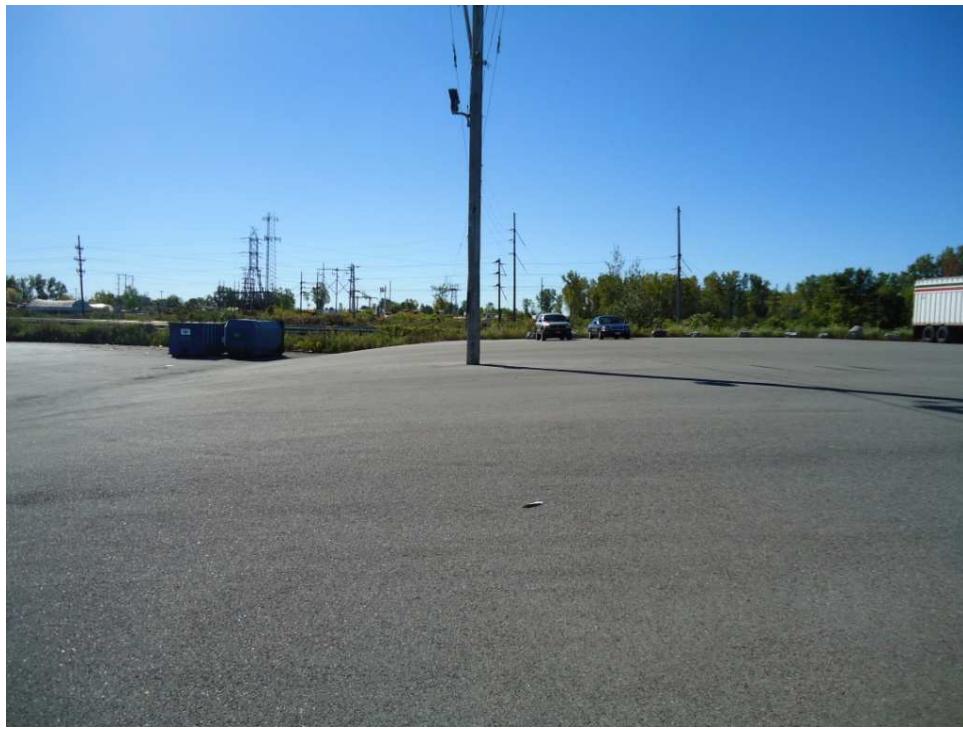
GCL and Asphalt Cover System looking south across east slope.
